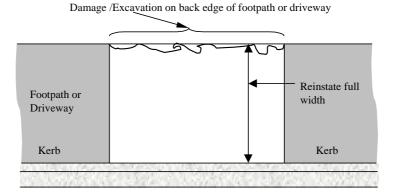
Excavation/Damage on edge of footpath or driveway
